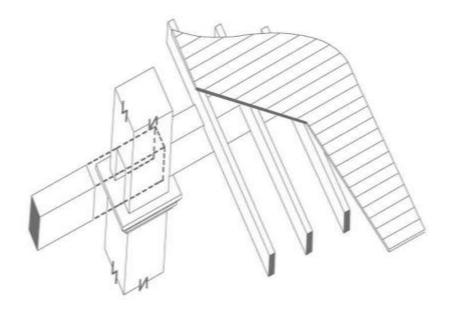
Sections of columns, beams and floors of the *Istana* connected using mortise and tenon joint method. (Abdul Aziz, A. 1997)
